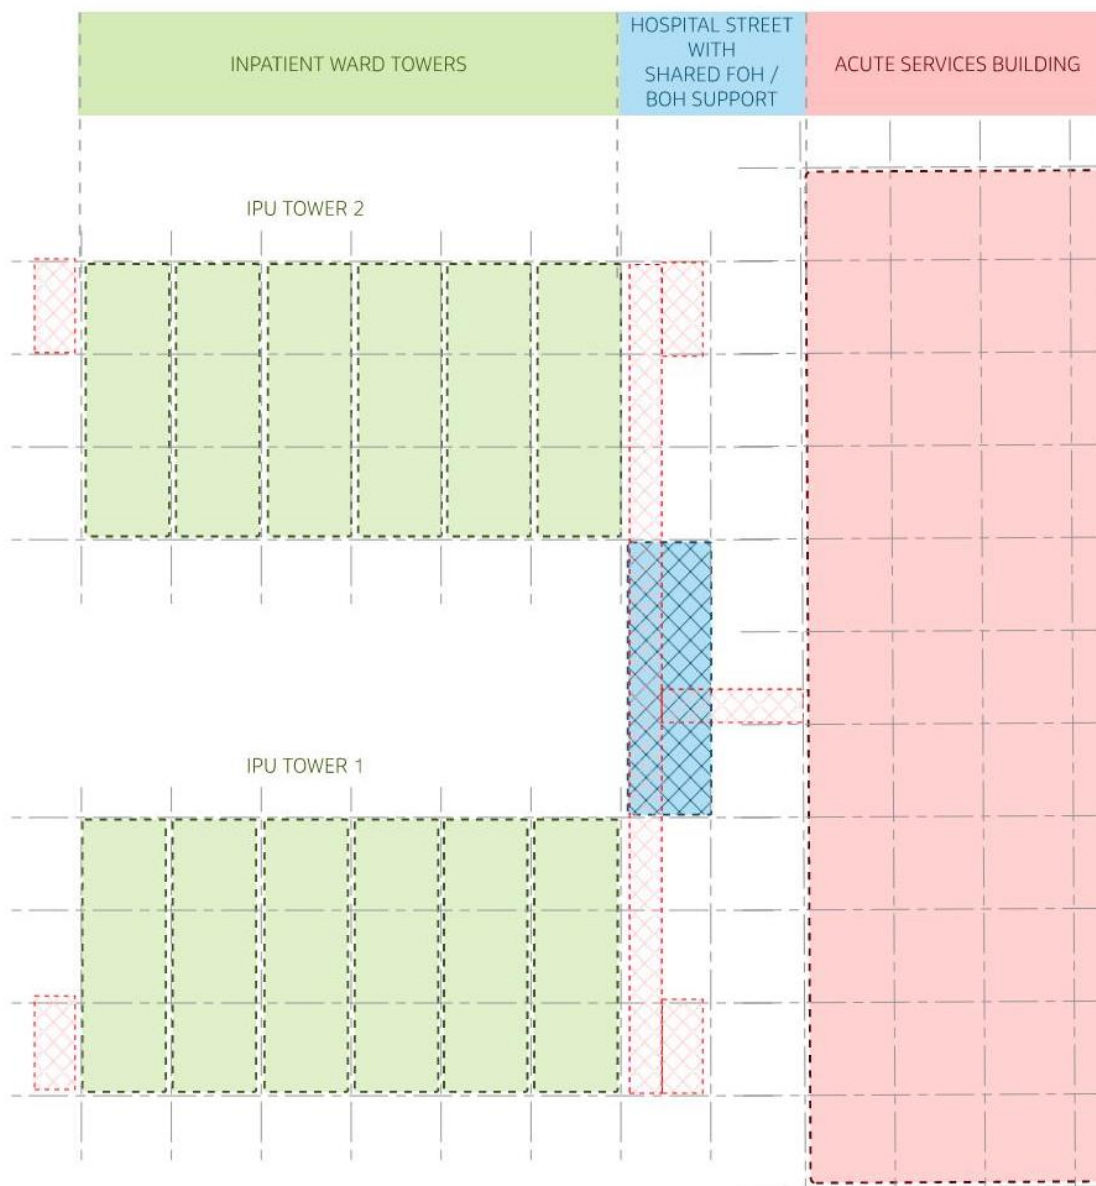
Arrangement with second IPU Tower and Acute Services Building
